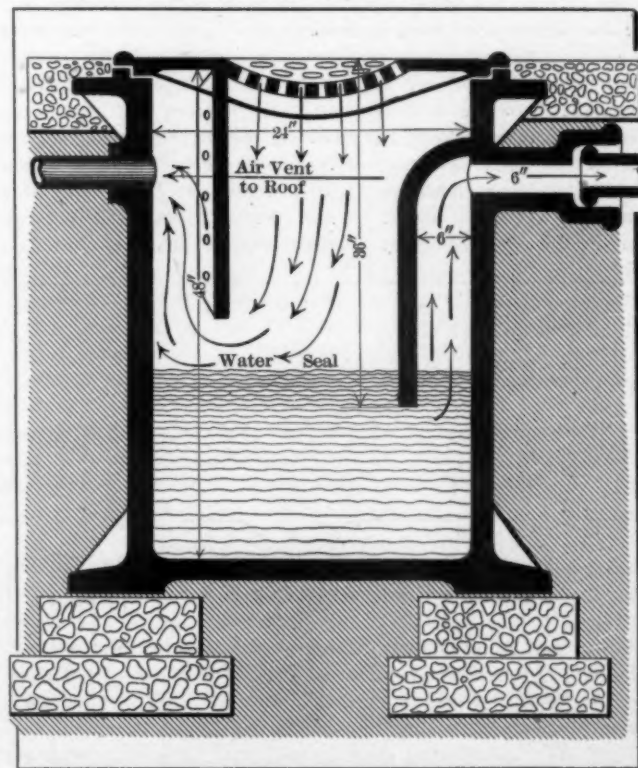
Well hole so shaped as to serve as a safety trap at the sewer opening in a garage, with means for preventing gas from entering the sewer, and a draught pipe to dispose of the gas
